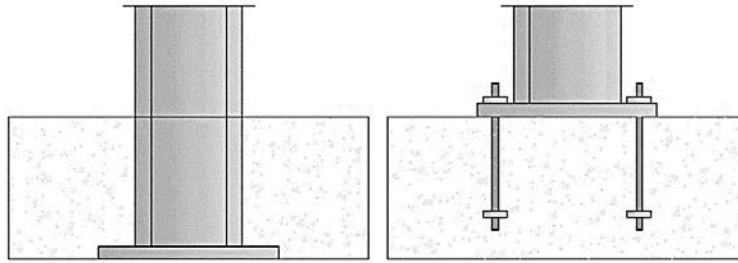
Traditional and embedded base plate-foundation connection [1]
